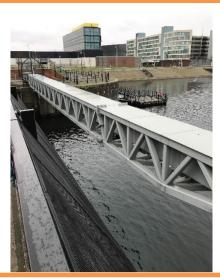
A VIEW OF WHERE THE PROPOSED BUILDING 2 IS LOCATED
